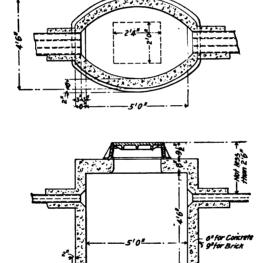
Vault Size 1 to be Used on Runs of 1 to 3 Ducts of Conduit when not Intersected.
